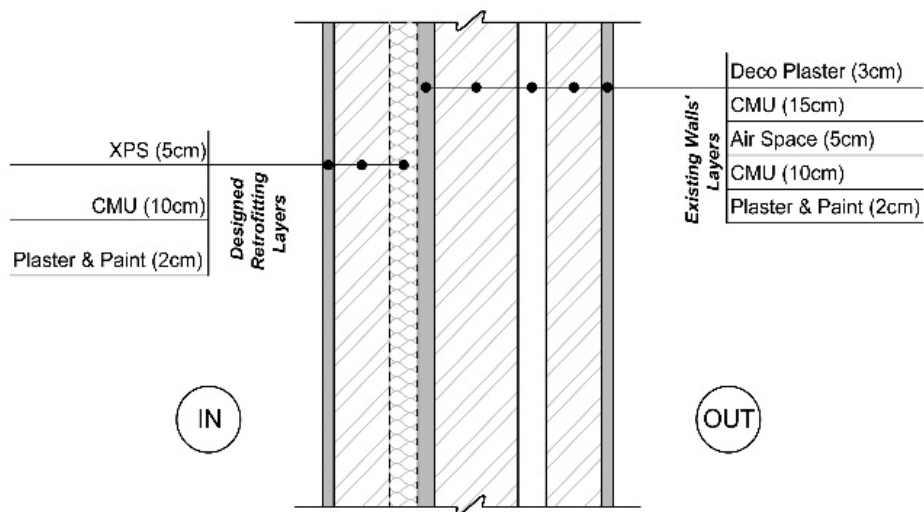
Typical cross-section through an external wall of the case study school showing existing and added retrofitting layers (N.T.C.). Drawn by the 1<sup>st</sup> author using AutoCAD 2022
